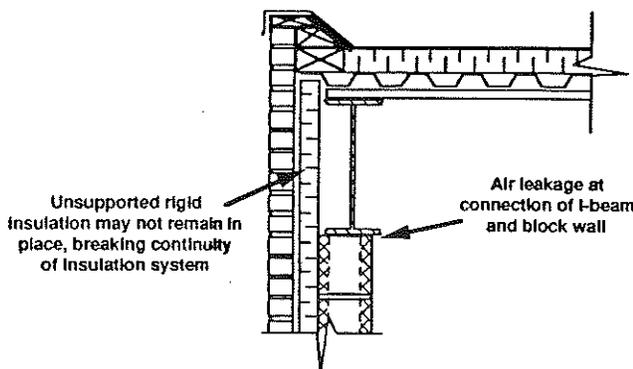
Deficient masonry wall/roof intersection (Turenne 1980).
